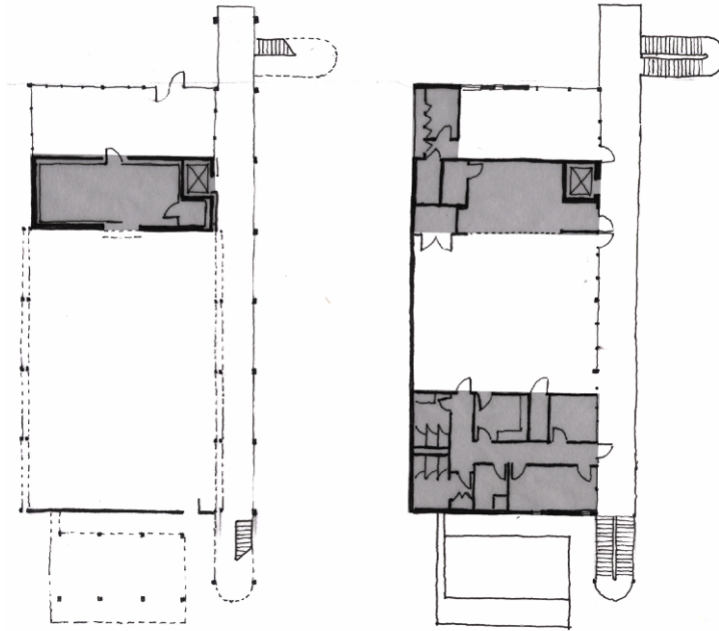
The ground floor (left) contains a large work room and a small retail space. The second floor contains office space, a meeting room and another retail space.
